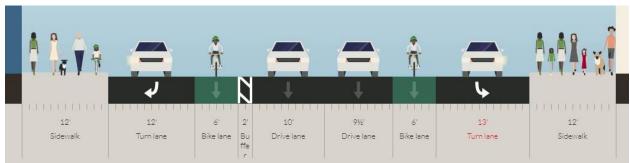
Howard Street section view between 11th Street and 10th Street, approaching 11th Street, looking east
